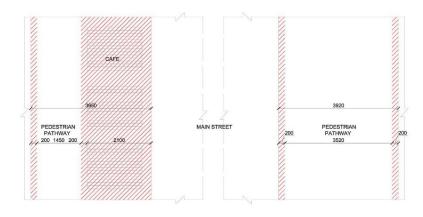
Street width and buffer spaces (in mm) for Gateway 11 in the area surrounding Frankfurt am Main Hauptbahnhof
